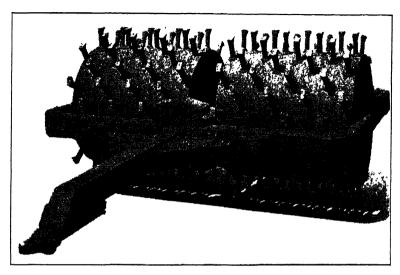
Tamping roller "sheepsfoot." (Compacting fills.) Courtesy of the Baker Manufacturing Company.
